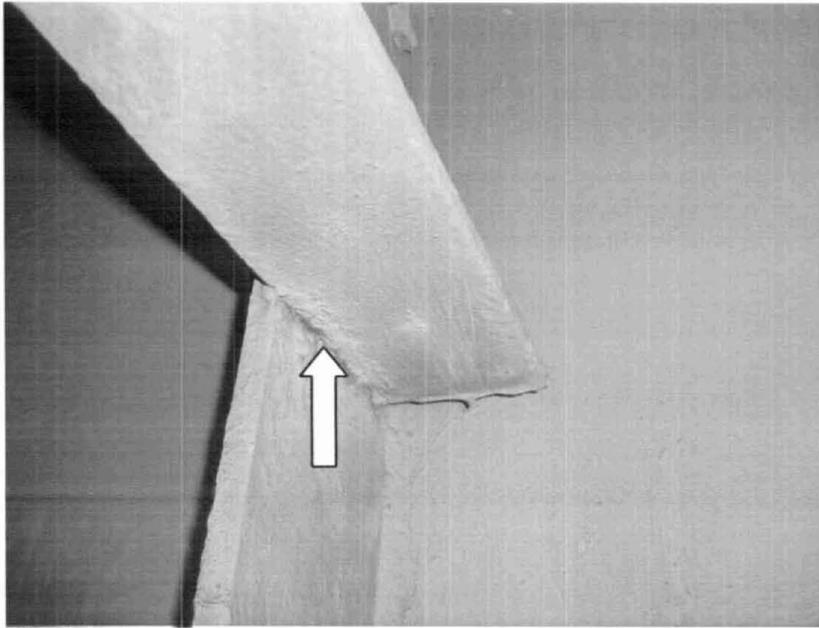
Sloppy/cracked weld between the web stiffener and diaphragm in span 1 on girder 3.
